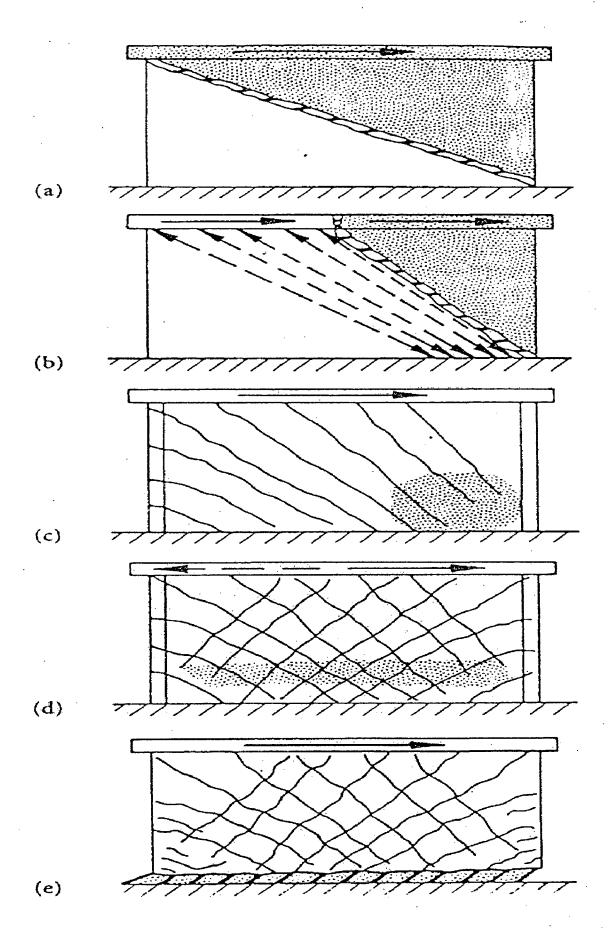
Shear Failure Modes in Squat Shear Wall (10)
